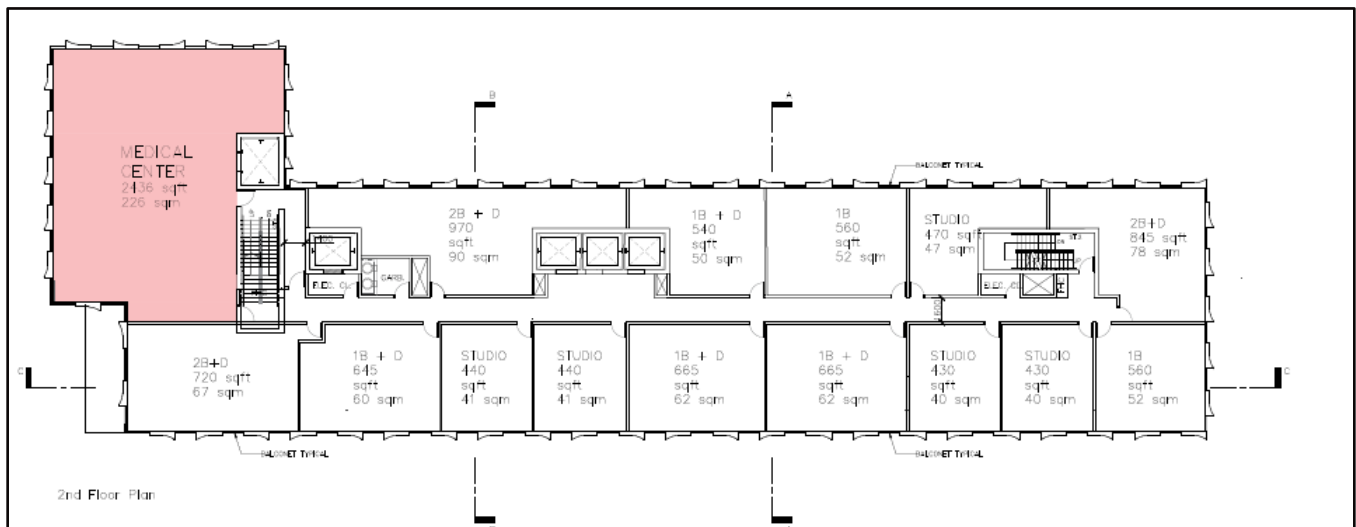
Second Floor Plan, Prepared by Hout Architecture
